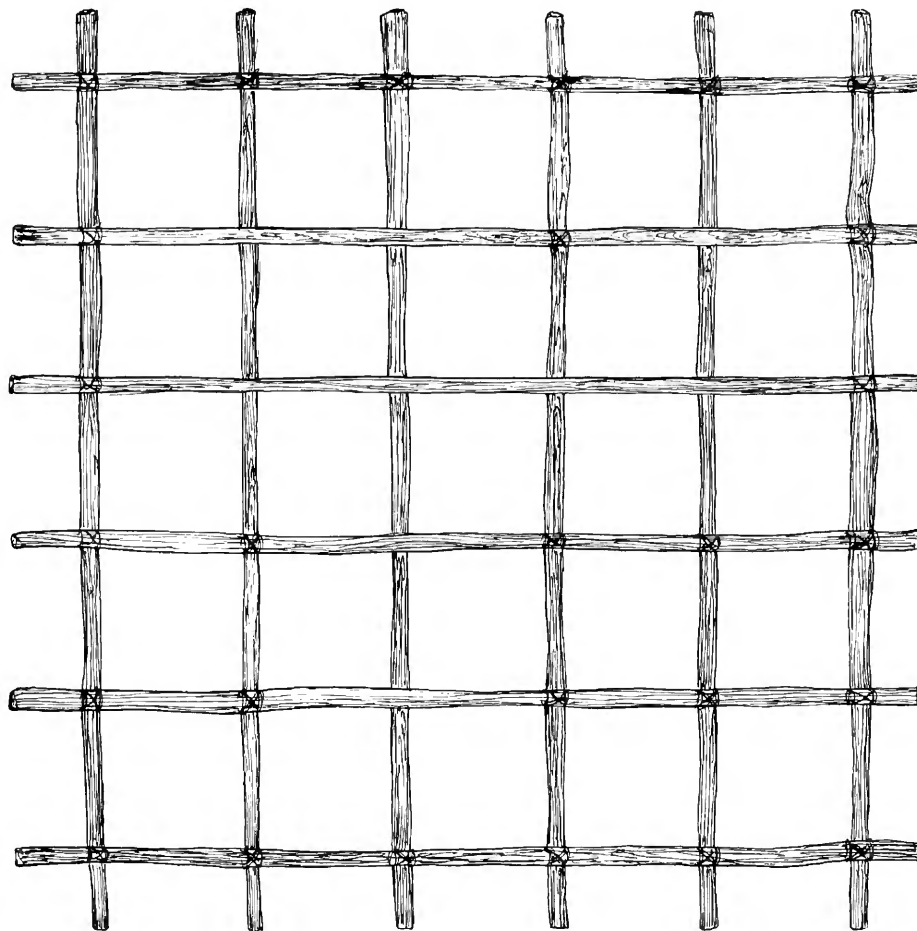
Roof plan of traditional house: plan of tie beams.
